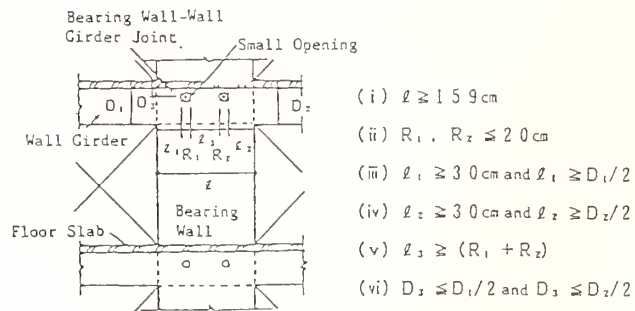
Small Openings in Bearing Wall-Wall Girder Joint
